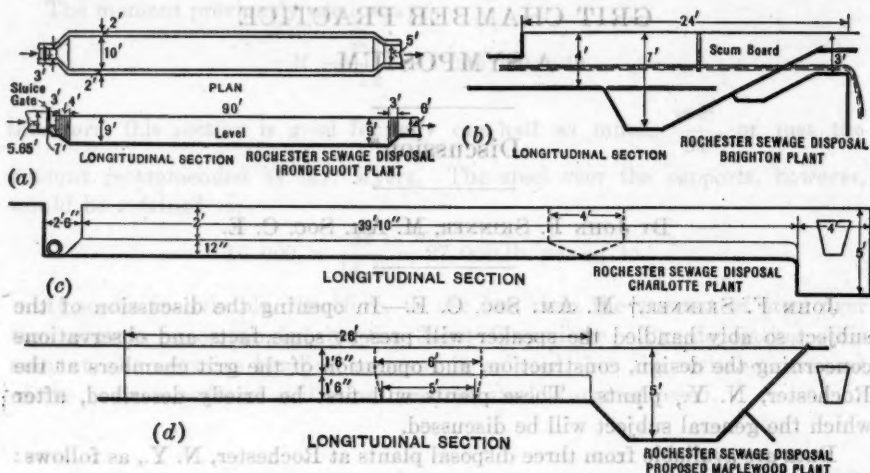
SECTIONS OF GRIT CHAMBERS OF SEWAGE DISPOSAL PLANTS, ROCHESTER, N. Y.
